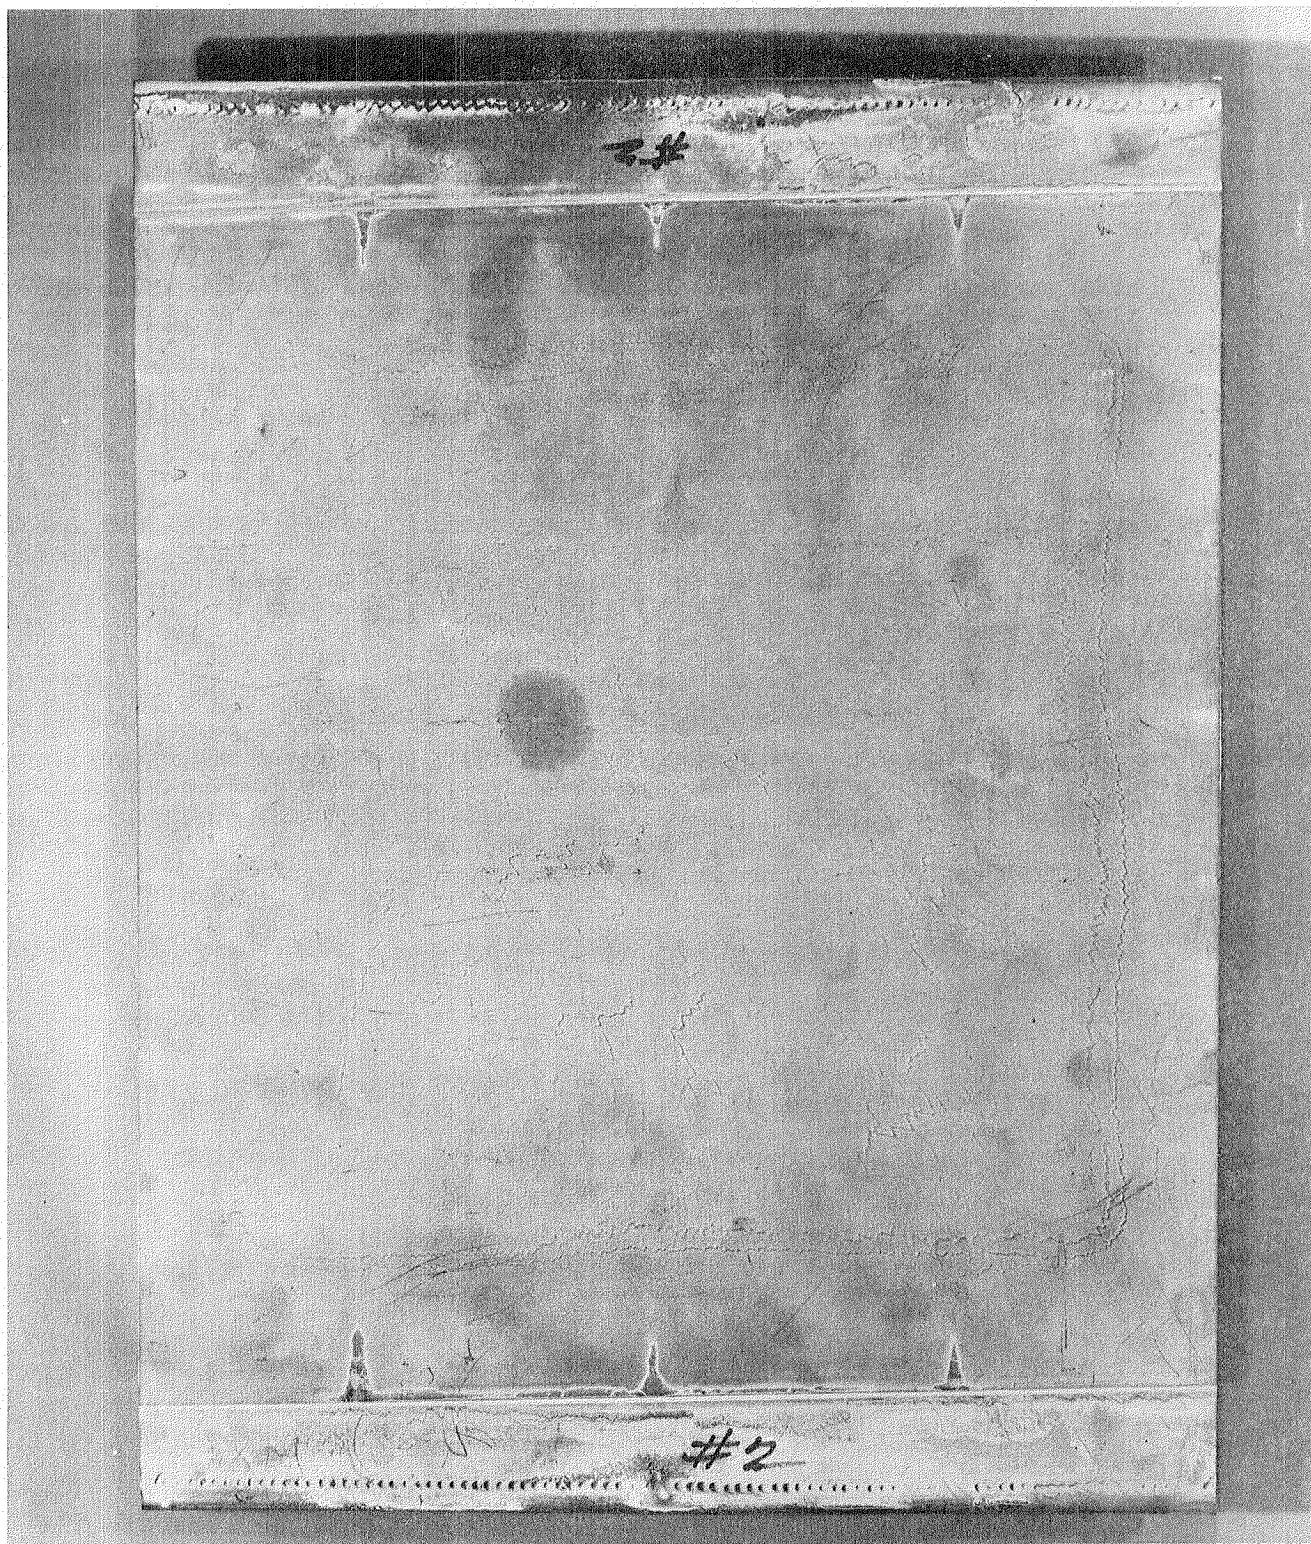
PANEL NO. 2 TOP FACE SHEET
